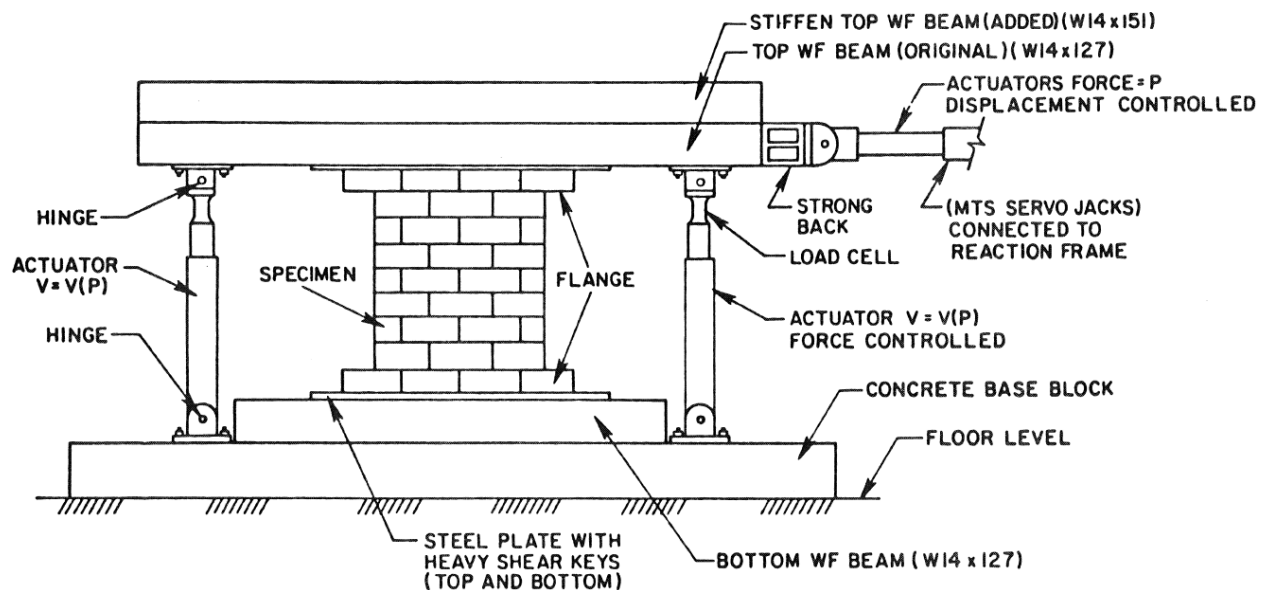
Masonry shear wall test setup from Sveinsson et al. (1985)
